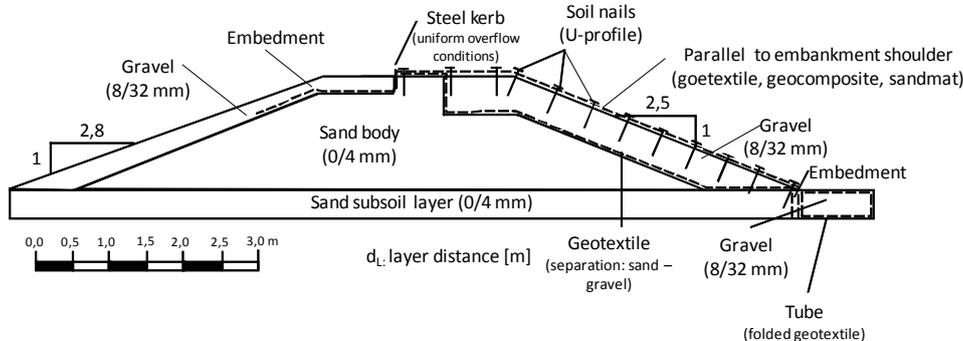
Dike model with layers parallel to embankment shoulder fixed by soil nails (Haselsteiner et al., 2008)
